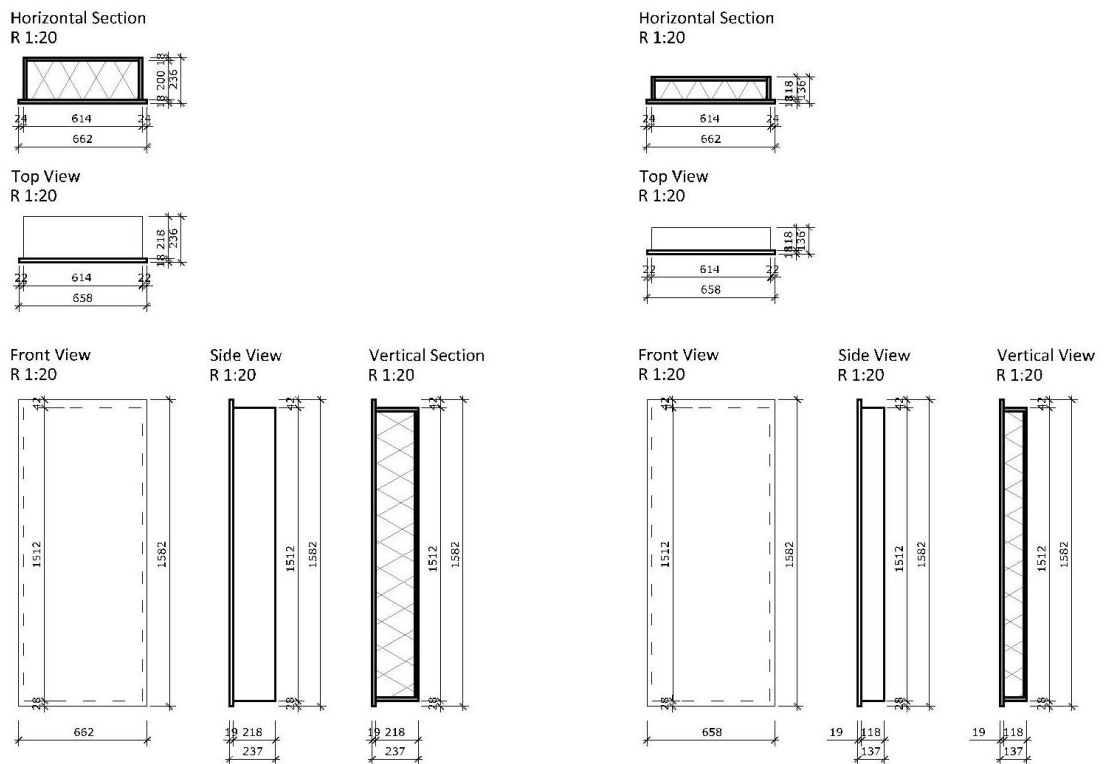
GDC wall system parts: wooden boxes. (source: 4D architects)
